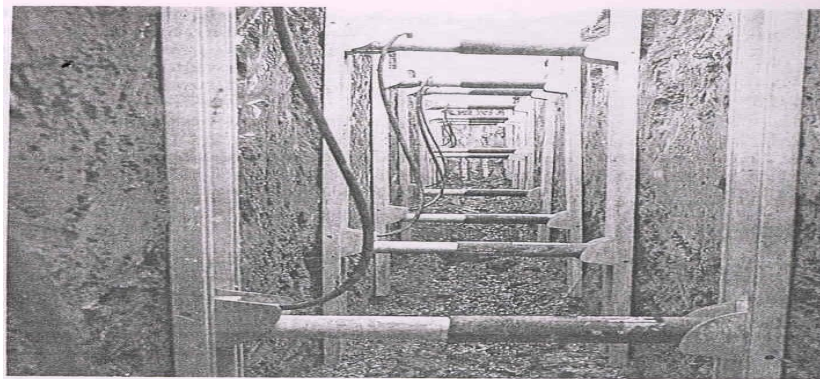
Vertical shoring system for use in ground not requiring close sh hydraulic cylinders are pressurised by a hand pump (courtesy Shorco)
